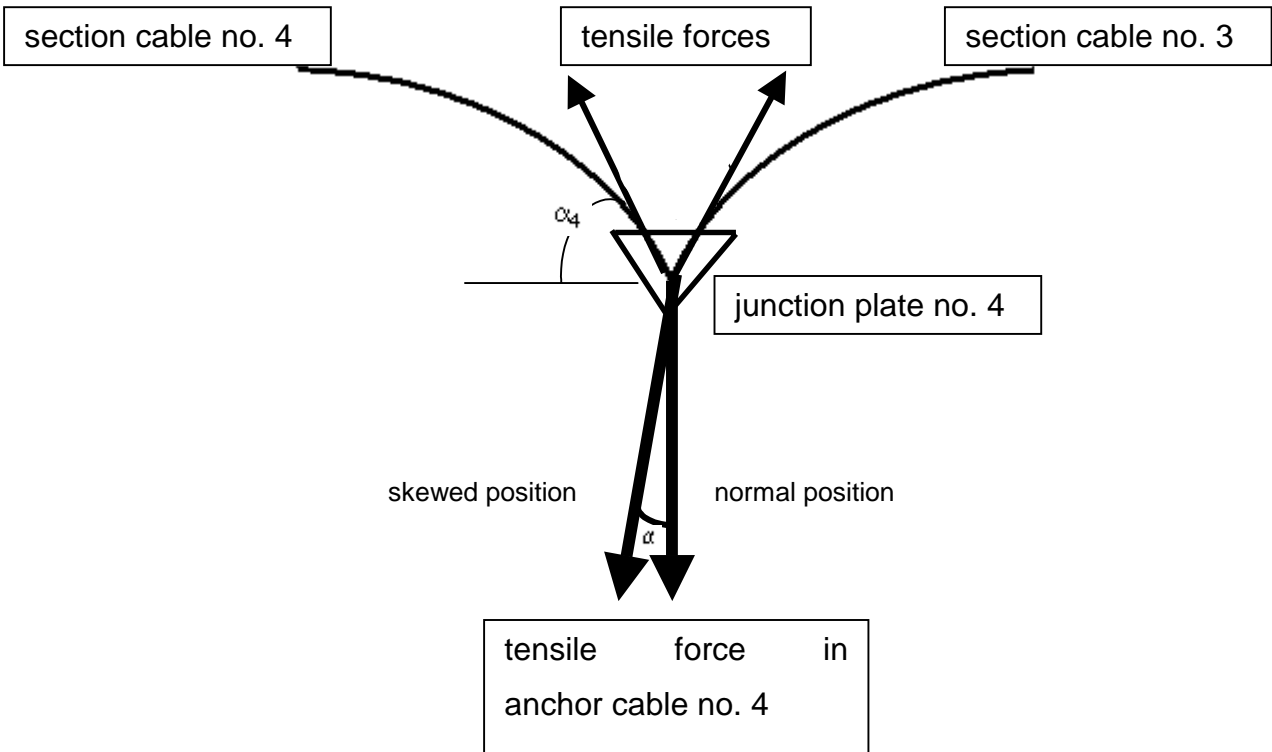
Sketch of cables at junction plate under normal and skewed loading
